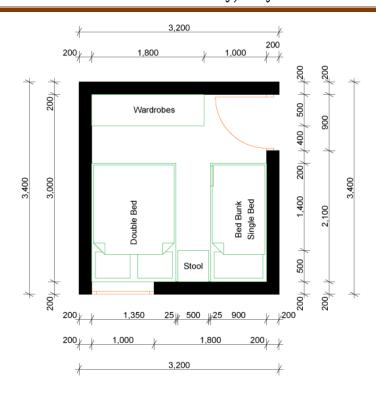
Two Bedroom, Bedroom, Furniture Layout One
